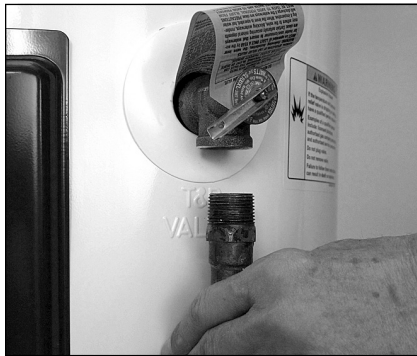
Removing the T&P Relief Valve discharge pipe.
